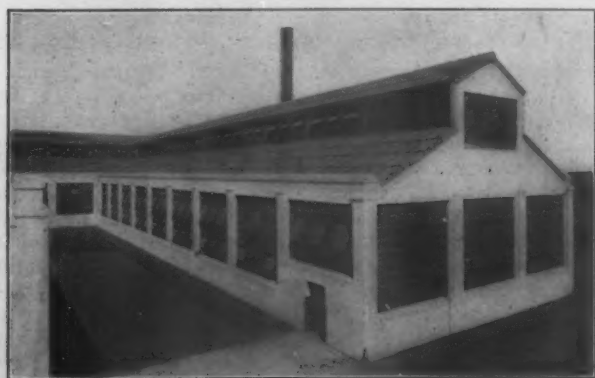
The Steel Foundry, Showing Details of Construction, Lighting and Ventilating.
